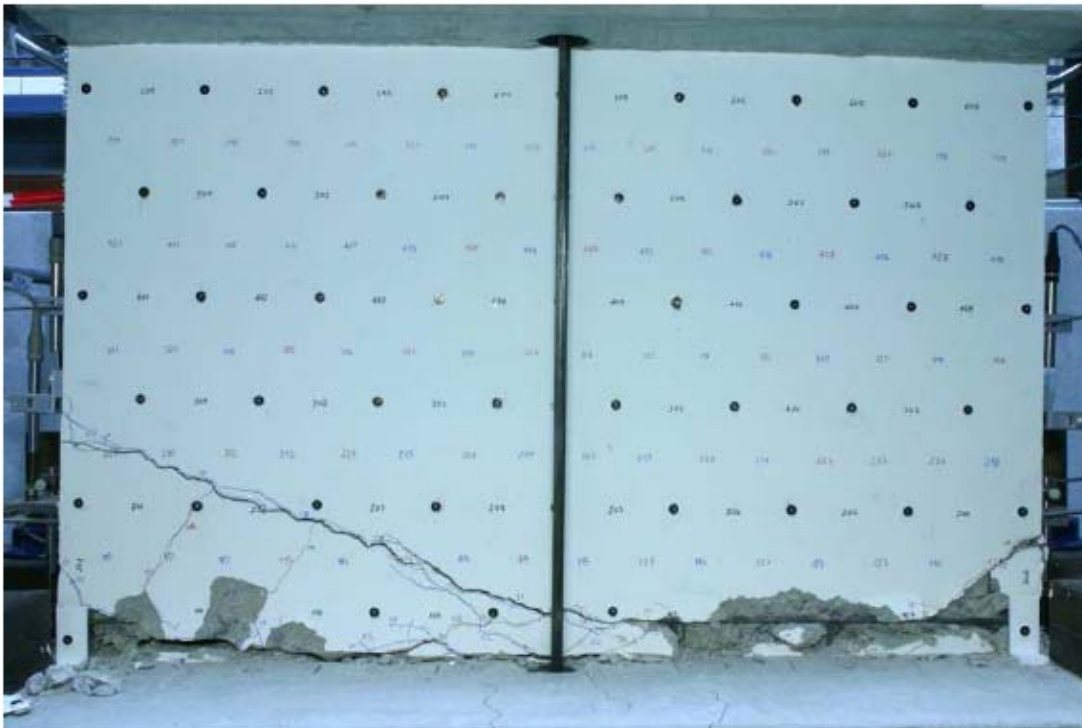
Cracking pattern for wall M1 tested by Greifenhagen et al. (2005) at reinforcement fracture
